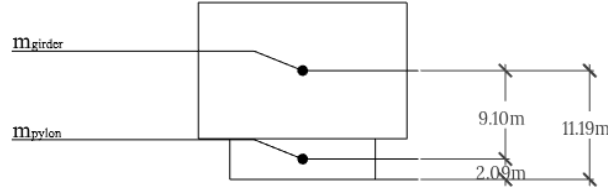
Pontoon 1 pylon and girder centers of mass.
